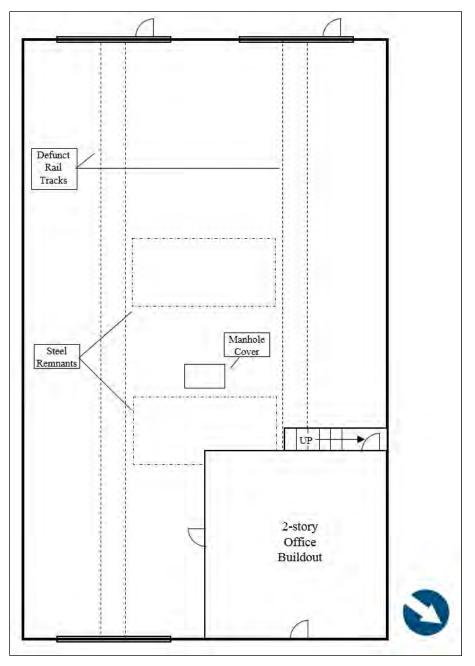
FLOOR PLAN FOR THE RF&P PAINT SHOP (043-5636) (NOT TO SCALE)
